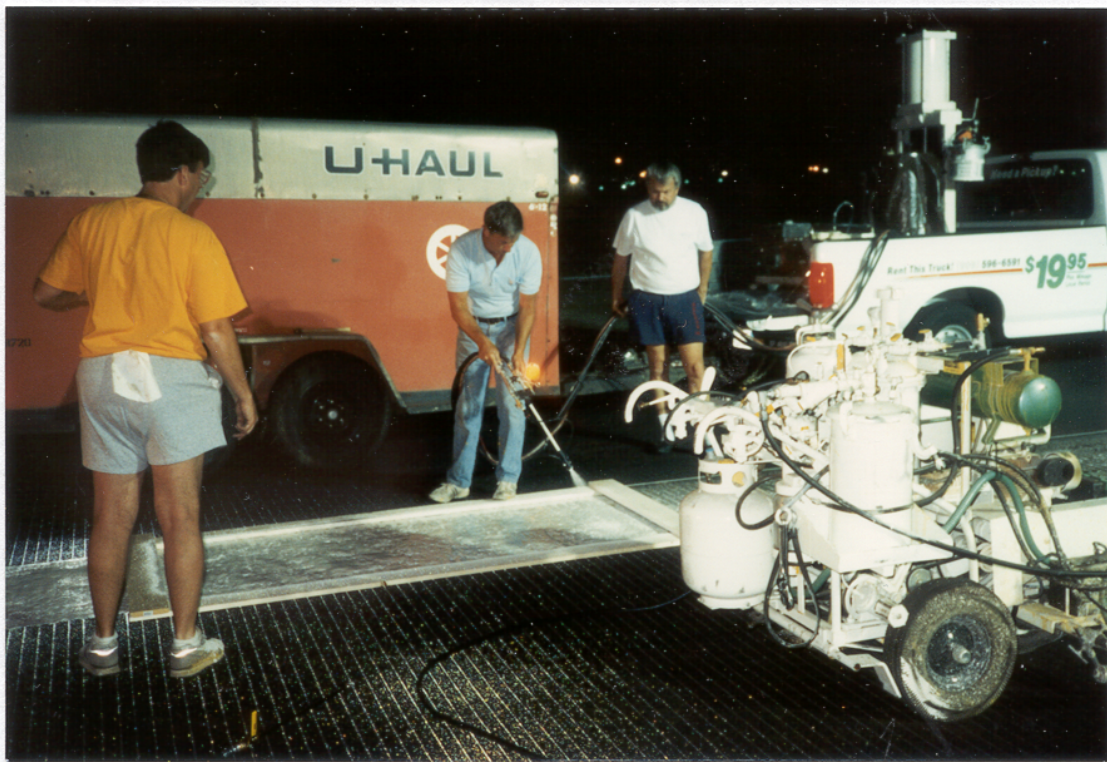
METHACRYLIC RESIN RUNWAY TEST STRIPE APPLICATION
